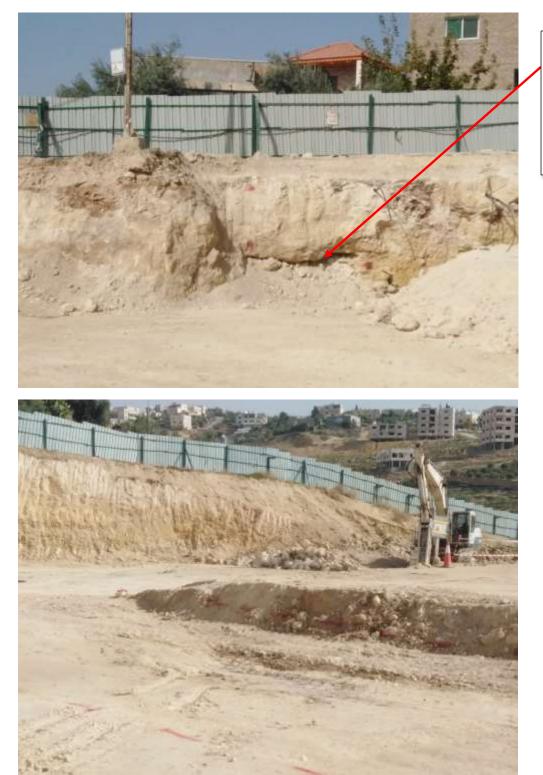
This area needs to be checked by Geotechnical lab to determine if it is a cavity or ont before starting the construction the retaining walls.
